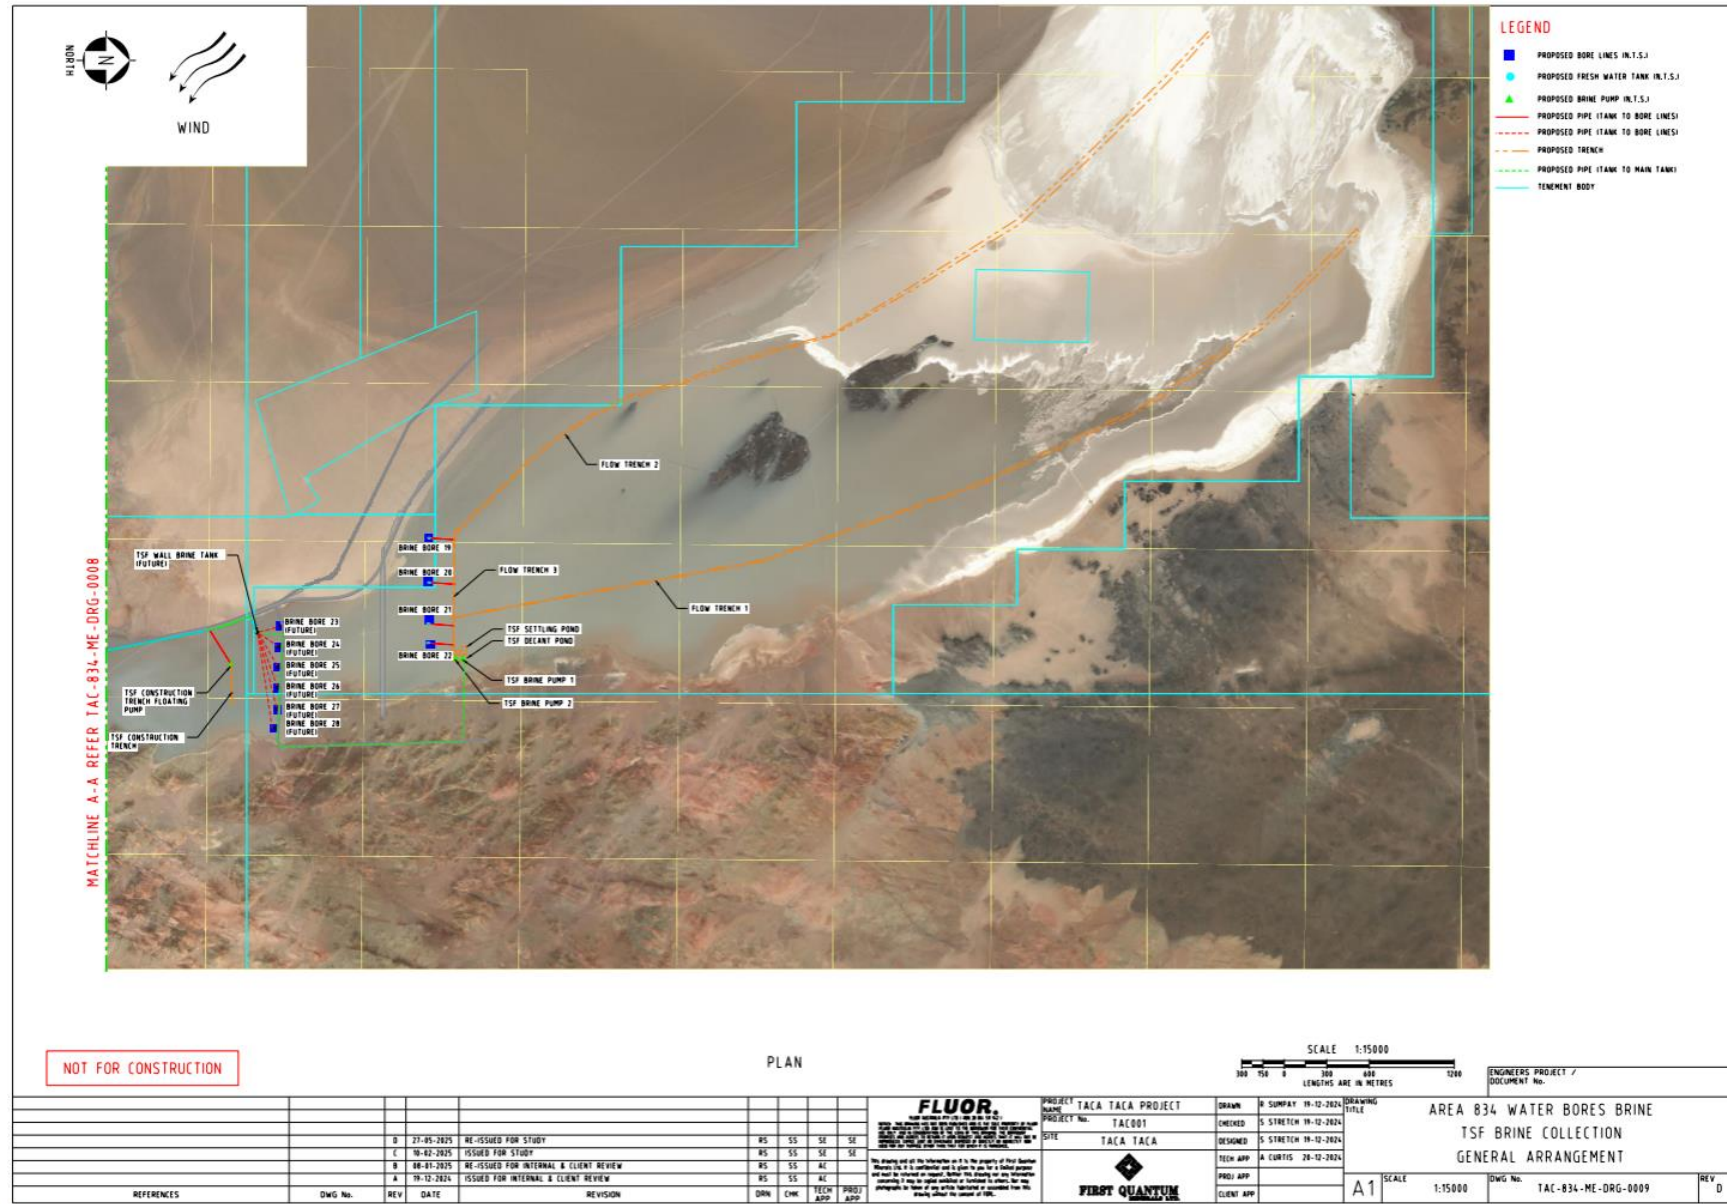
Tailings storage facility brine bores and trenches (source: Fluor, 2024)
